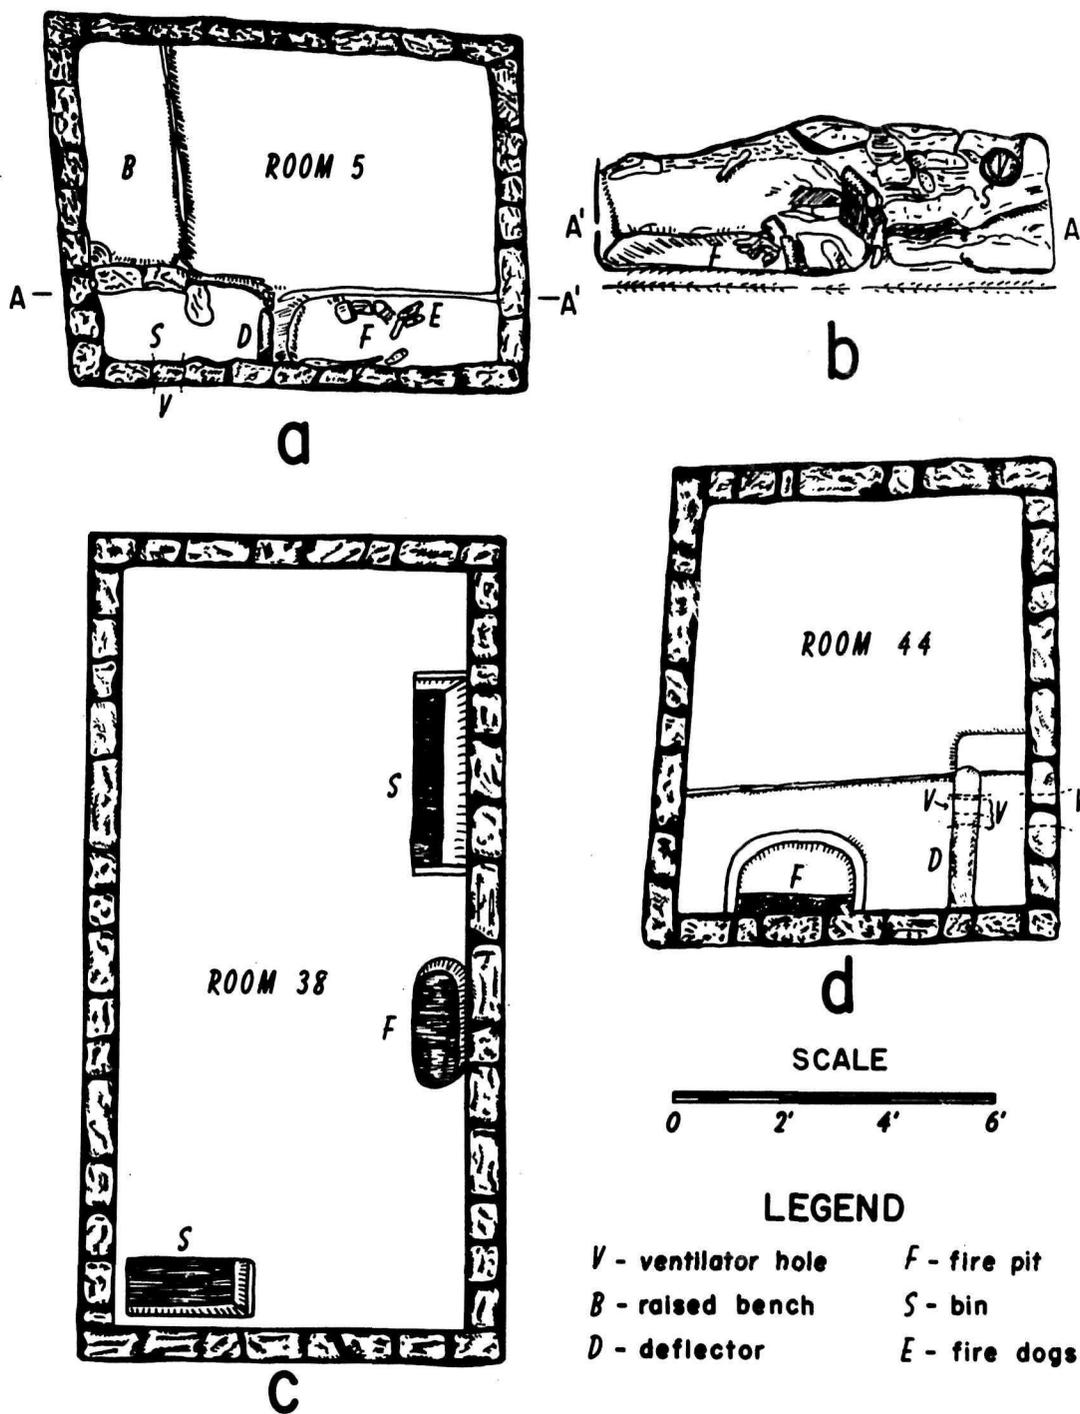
Architectural details of Rooms 5, 38 and 44.
